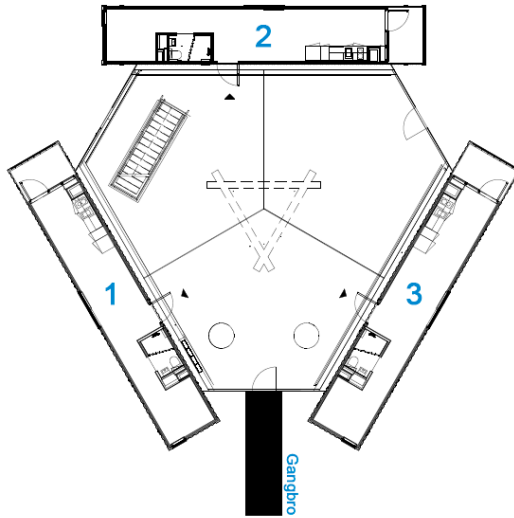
Ground floor [Urban Rigger, n.d.]
